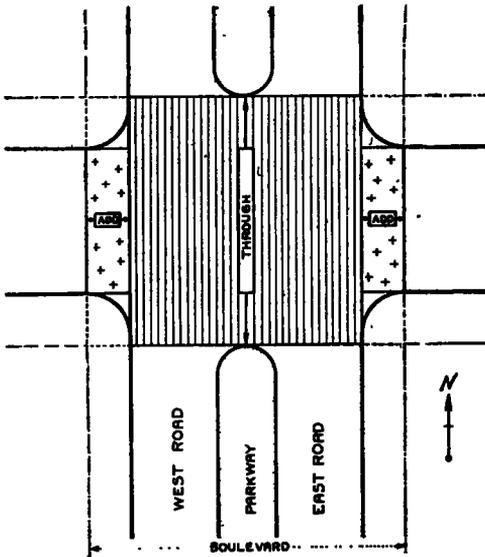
Standard Intersection with Boulevard or Divided Lane Roadway
